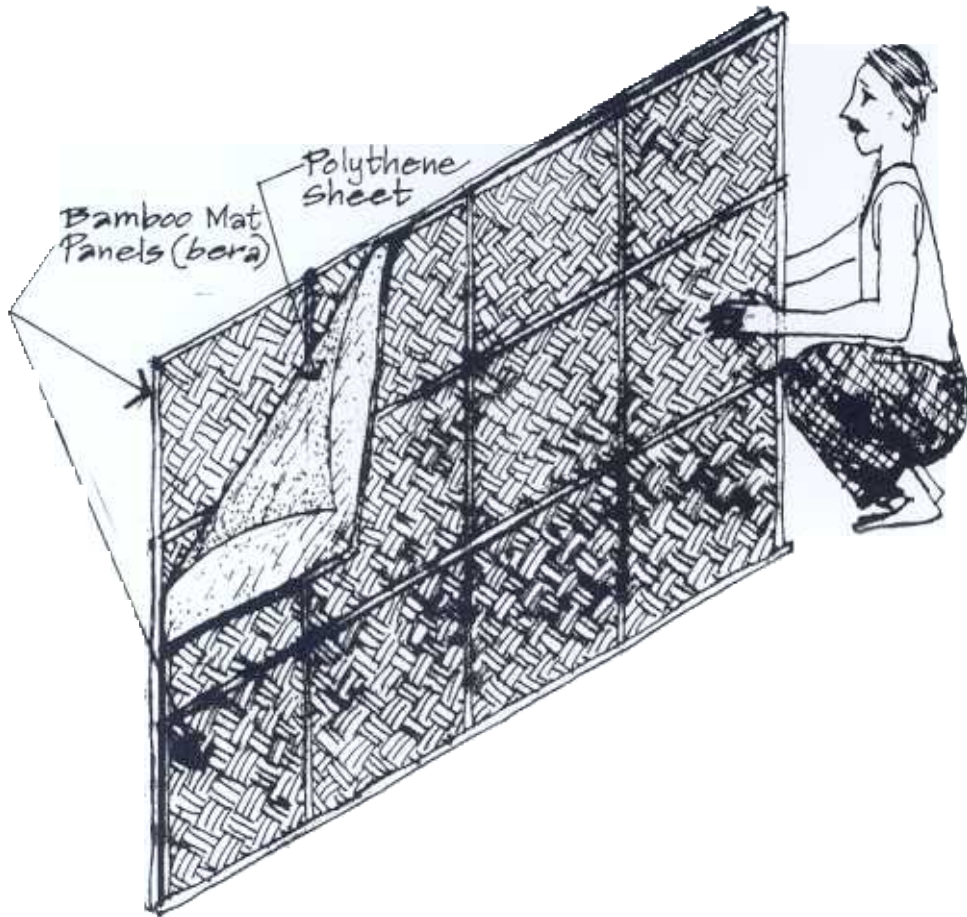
Polythene Sheet Used in Roof Mat Sandwich
